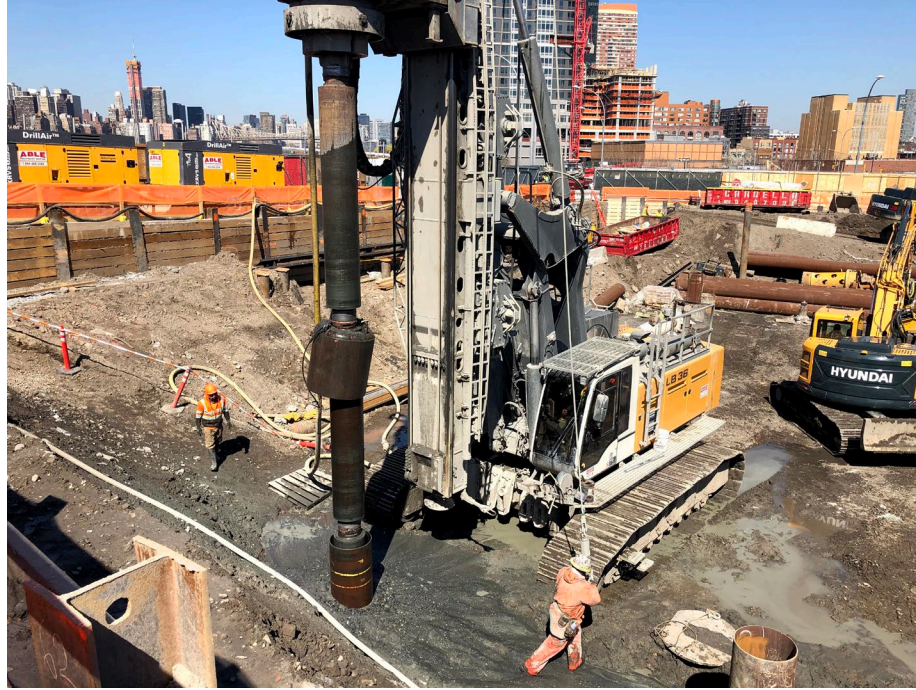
Looking north, New Leaf drilling in WCF-C3.
